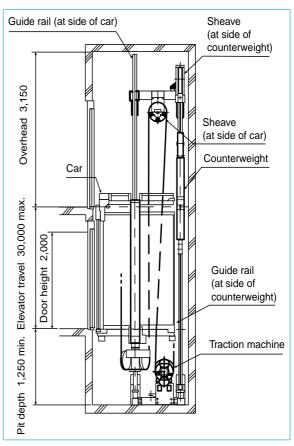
Elevator shaft, vertical section (dimensions in mm).
